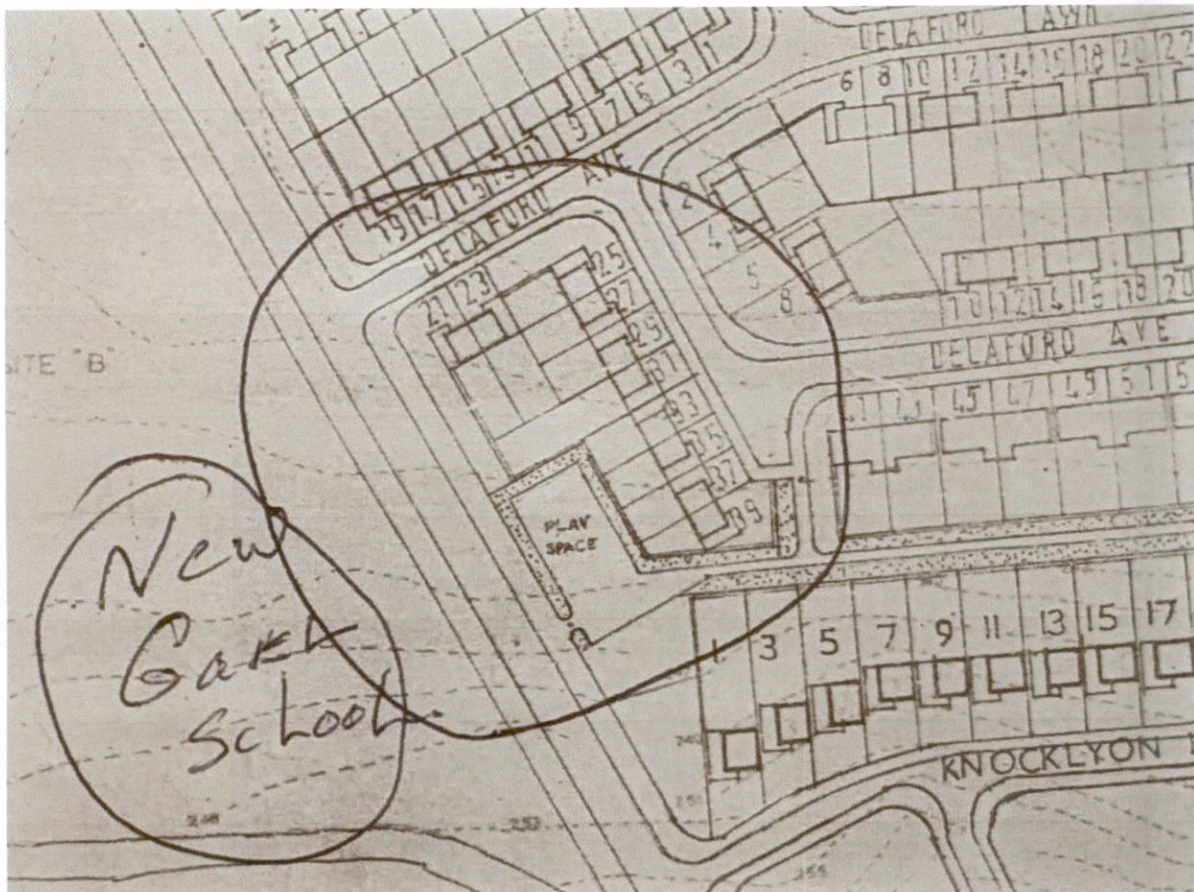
DELAFORD AVENUE HOUSES ADJOINING THE APPLICATION SITE
